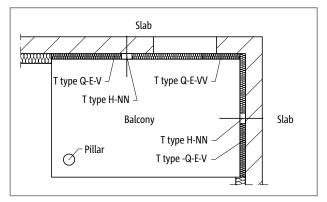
Schöck Isokorb® T type H: Balcony supported on two sides with pillar
